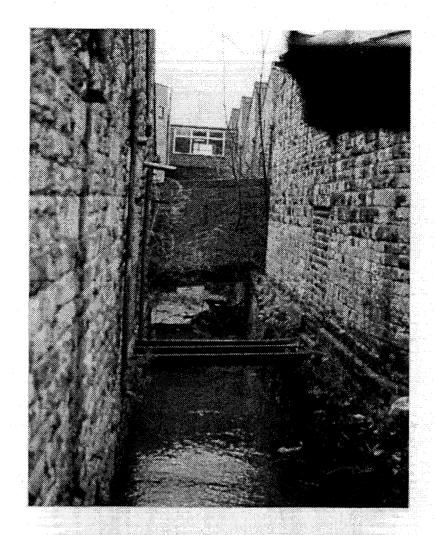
CULVERT No.22 (Inlet above - Outlet below)
